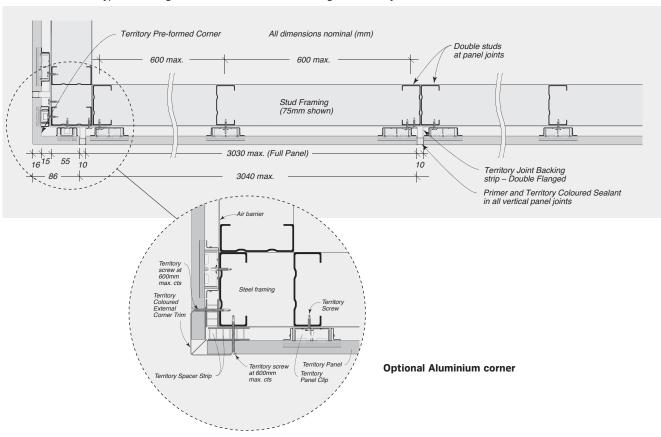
Typical Territory System Cross Section for Steel Framing - Elevation
